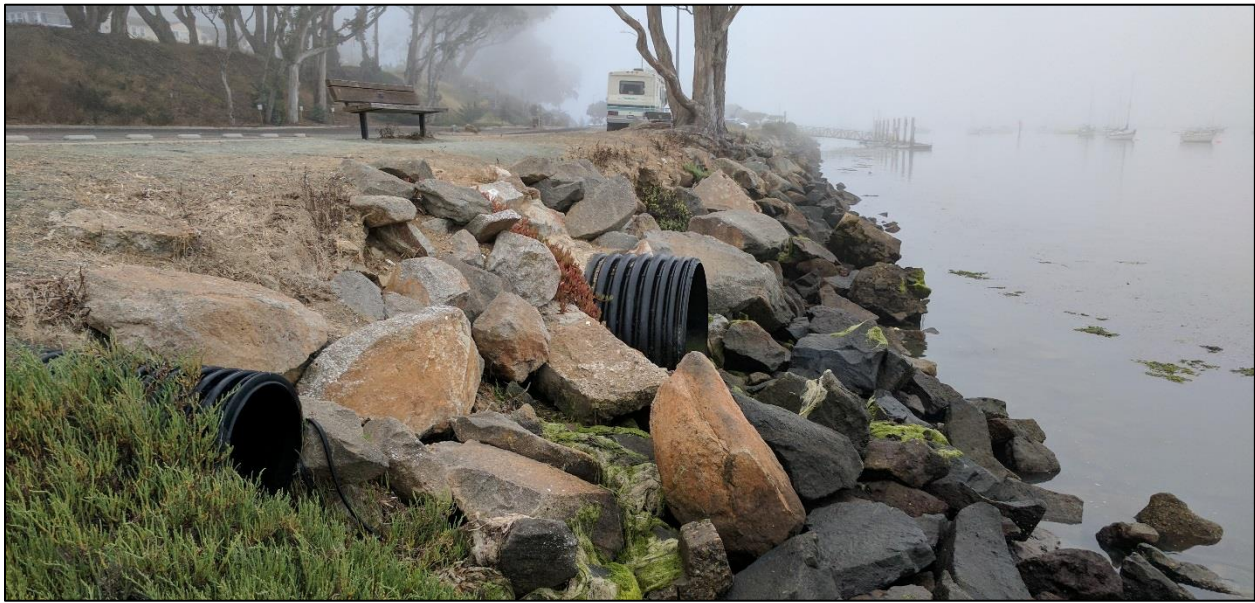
STORM DRAIN OUTFALL ALONG THE EMBARCADERO
